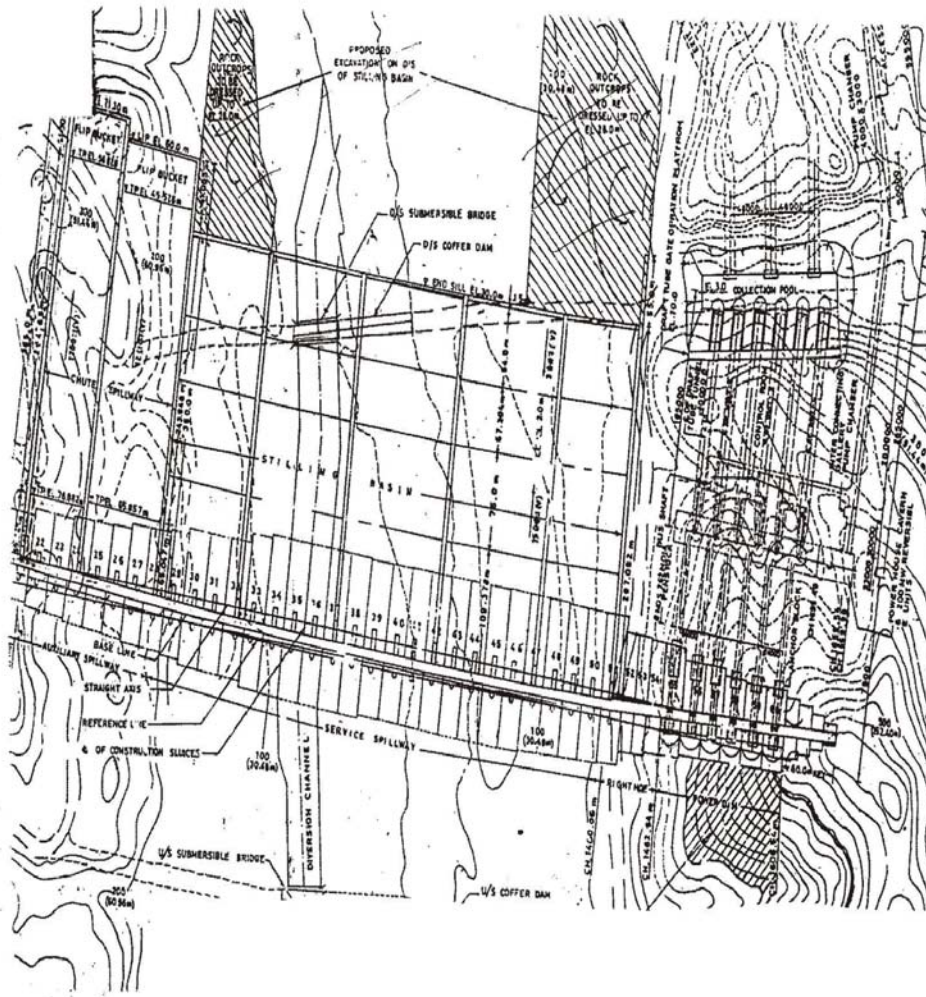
LAYOUT OF SARDAR SAROVAR DAM ON RIVER NARMADA AND ITS UNDERGROUND POWER HOUSES WITH CORRESPONDING INTAKES AND TAIL RACE TUNNELS / CHANNELS
